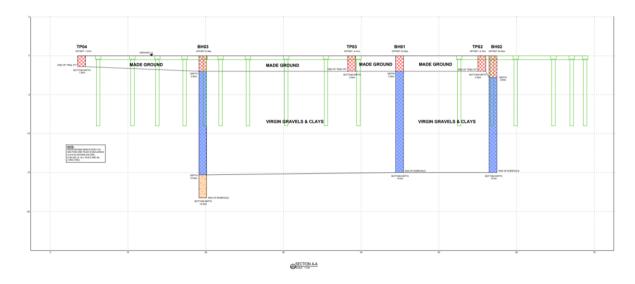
Section A-A on Fig. 19 showing proposed piling and 'made ground' and 'virgin gravels and clays' indicated from geotechnical investigations (DRA Consulting Engineers).
